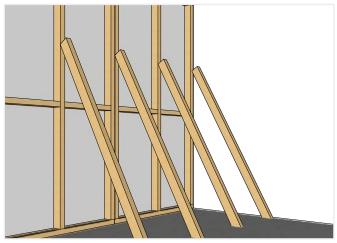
LIFT AND ANCHOR - WALL MODULES
